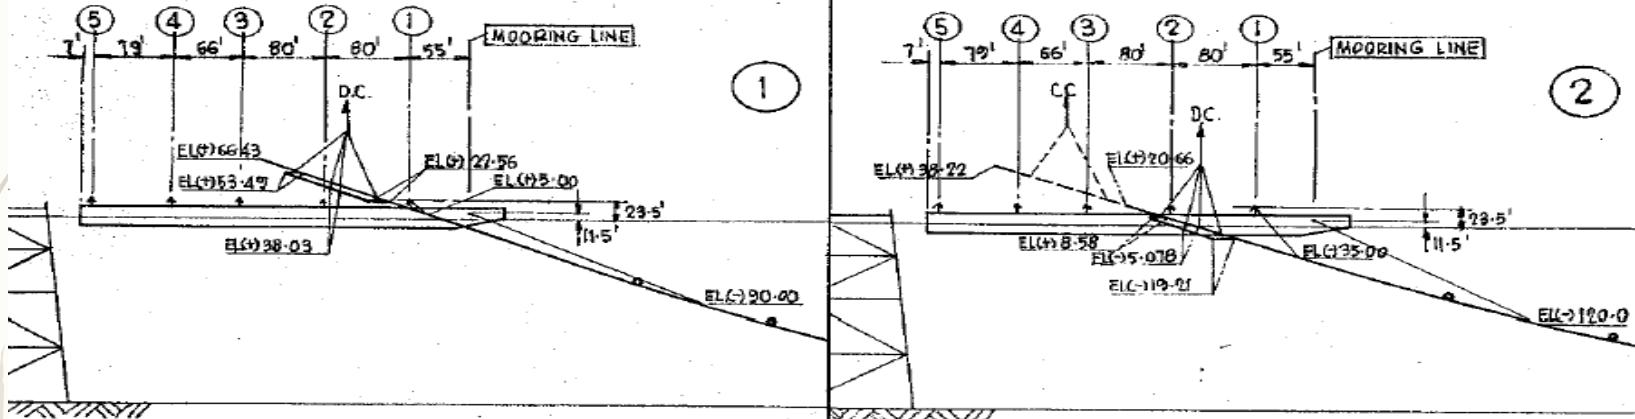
D.1 ATTACHMENT OF U-BEND TO PIPE
